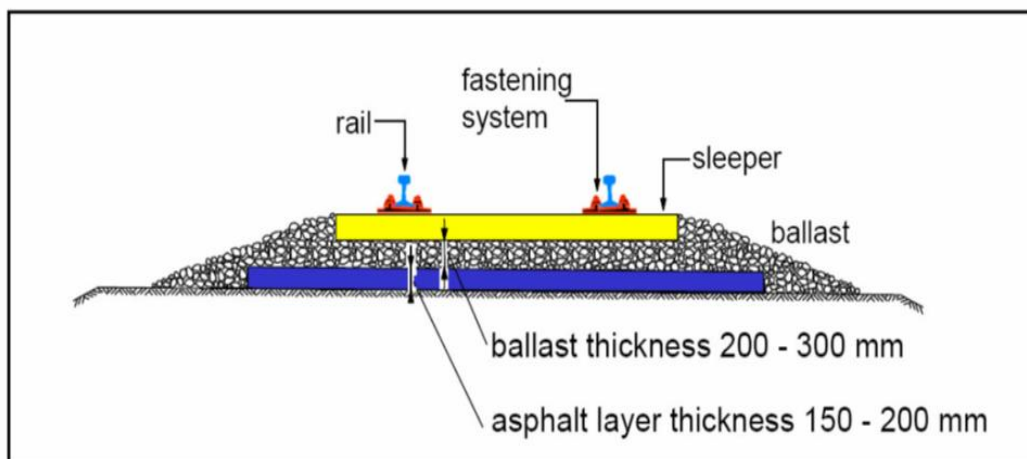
Typical cross sections of tracks with sub-ballast (Mittal, ---)
